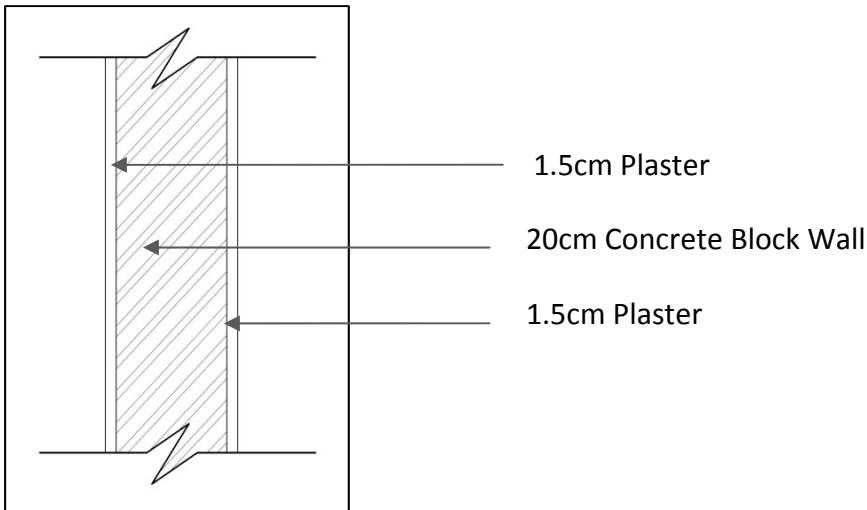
Detail of external wall (DM Construction System 5). Source: (DM,2010).
